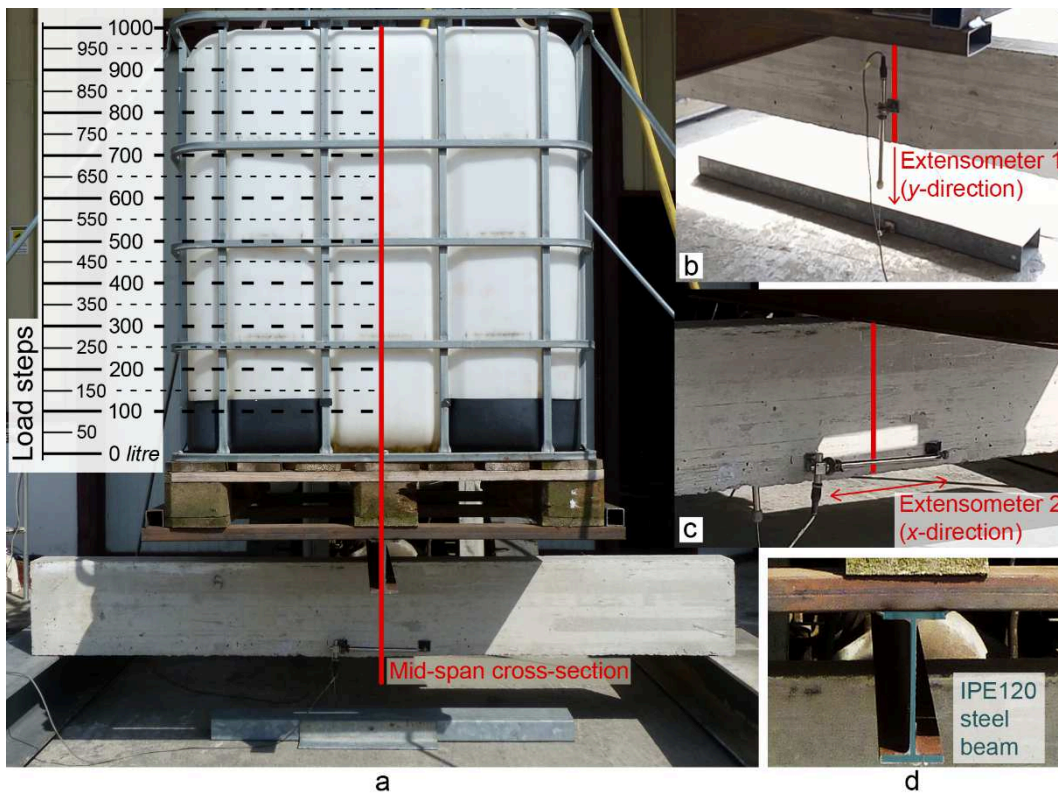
Test set-up: a) test apparatus with load steps indication; b) position of the extensometer 1; c) position of the extensometer 2; and d) detail of the steel beam used to transfer the load
